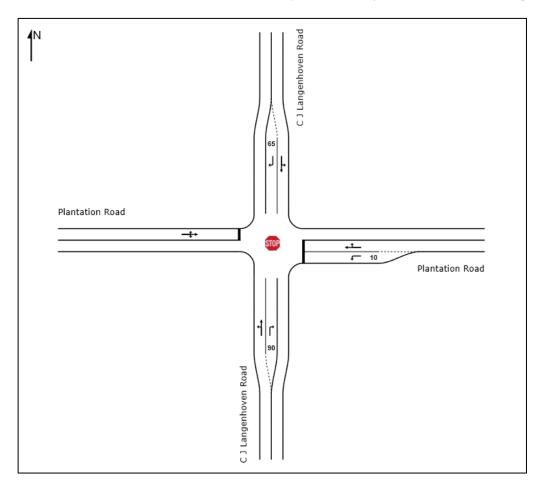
National Route 9 (C J Langenhoven Road) and Plantation Road: Existing Layout
